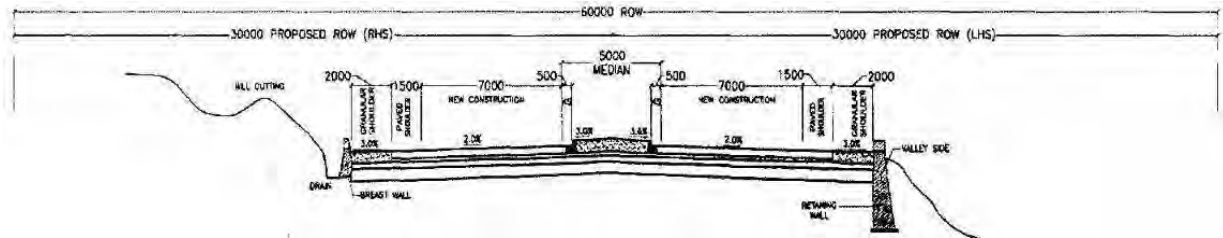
Typical Cross Section for ghat section (TCS-5)
